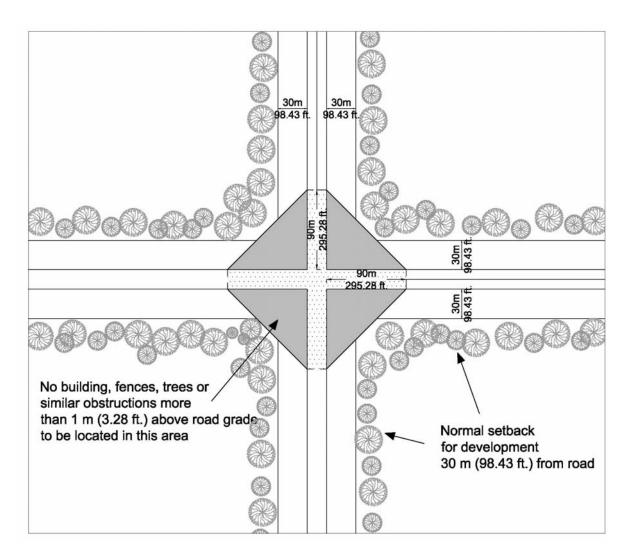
LOCATION OF DEVELOPMENT AT THE INTERSECTION OF A MINOR TWO LANE HIGHWAY WITH A LOCAL ROAD
